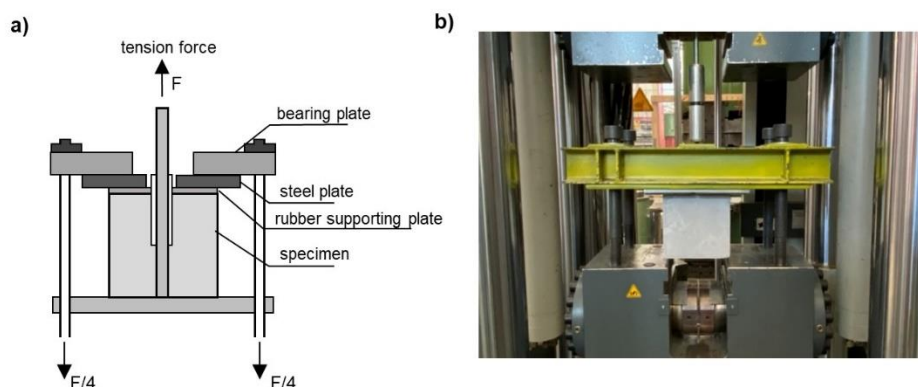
Pullout tests according to RILEM RC 6; a) schematic drawing of the test setup, b) test setup in the testing machine.
